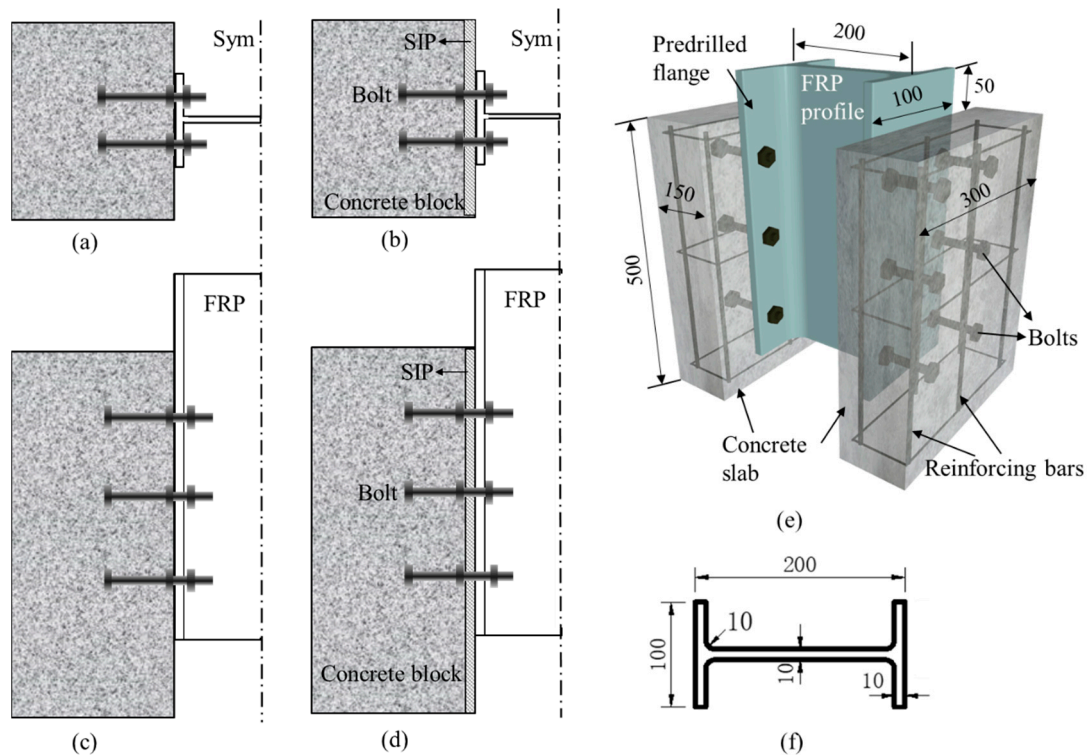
Illustration of a push-out test specimen (unit in mm): (a) Half cross section of specimens S-1,2; (b) Half cross section of specimens S-3,4; (c) Half illustration of vertical cross section of S-2; (d) Half illustration of vertical cross section of S-4 (note that ‘Sym’ denotes the ‘symmetric line’); (e) Schematic graph of push-out test of specimen S-2; and (f) Cross section of the FRP segment.
